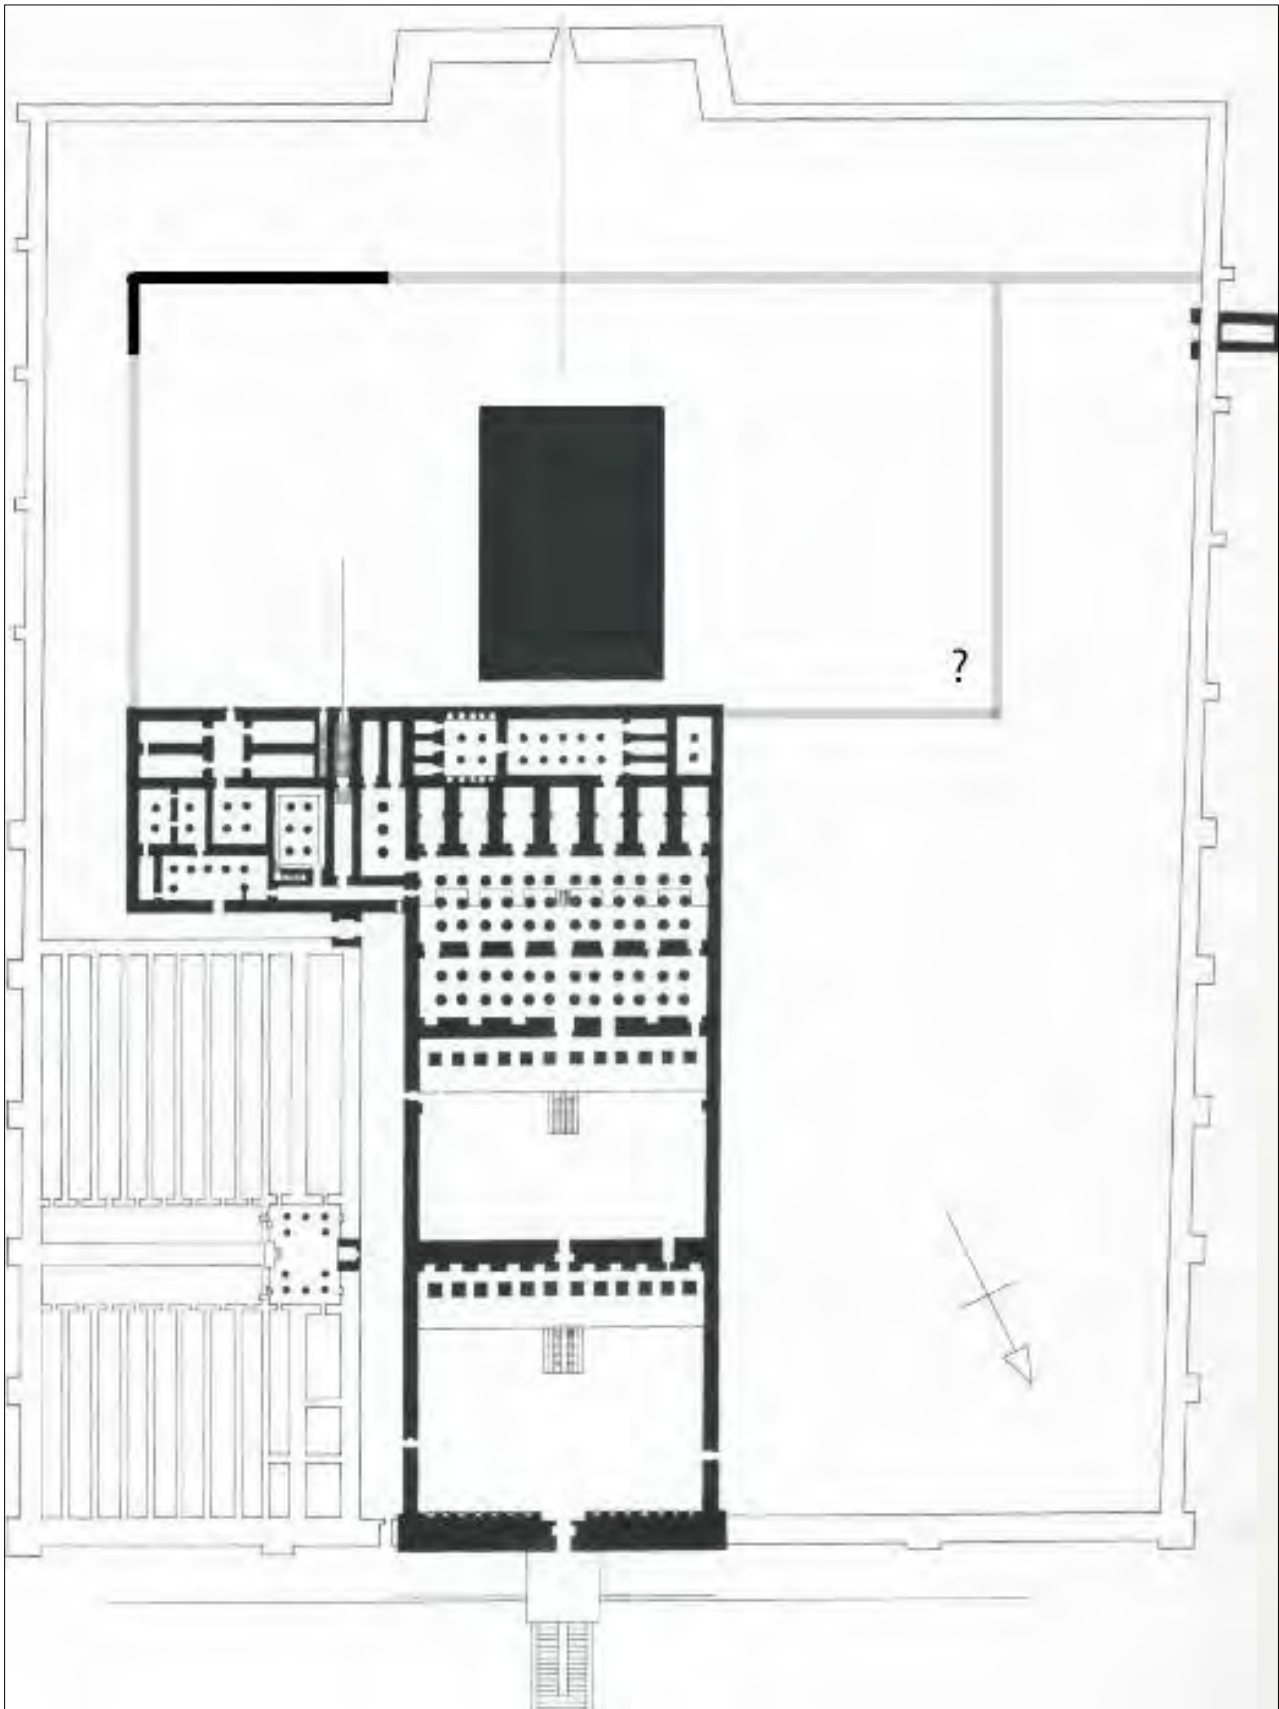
Temple Plan Skewed Notional West Temenous Wall with Sacred Precinct added
